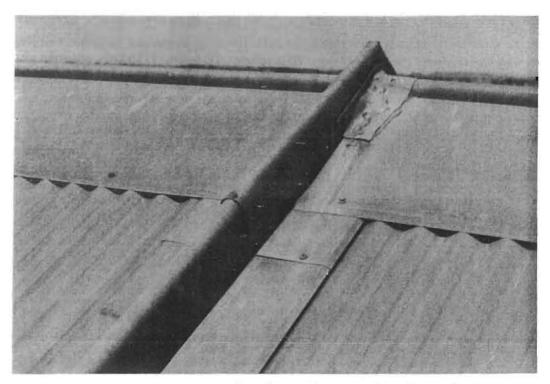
An expansion join, at the place where it joins the roof ridge.
